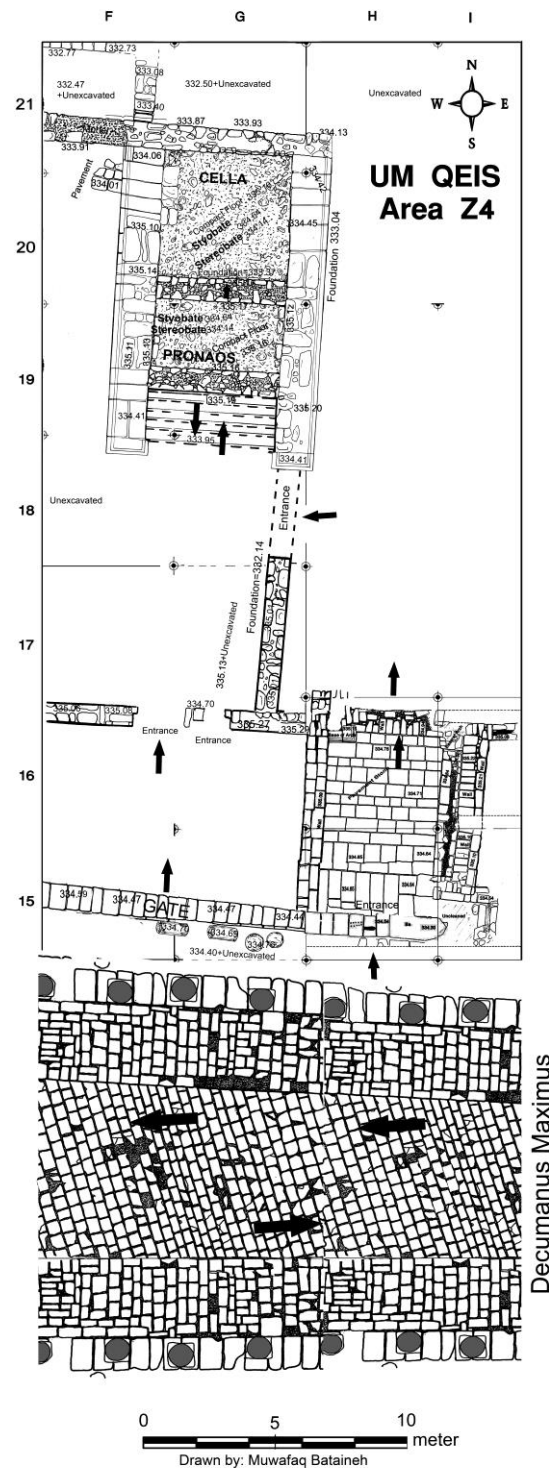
Plan of the different sections of area Z4 above the excavated water tunnel (Shiyab, 2019).
